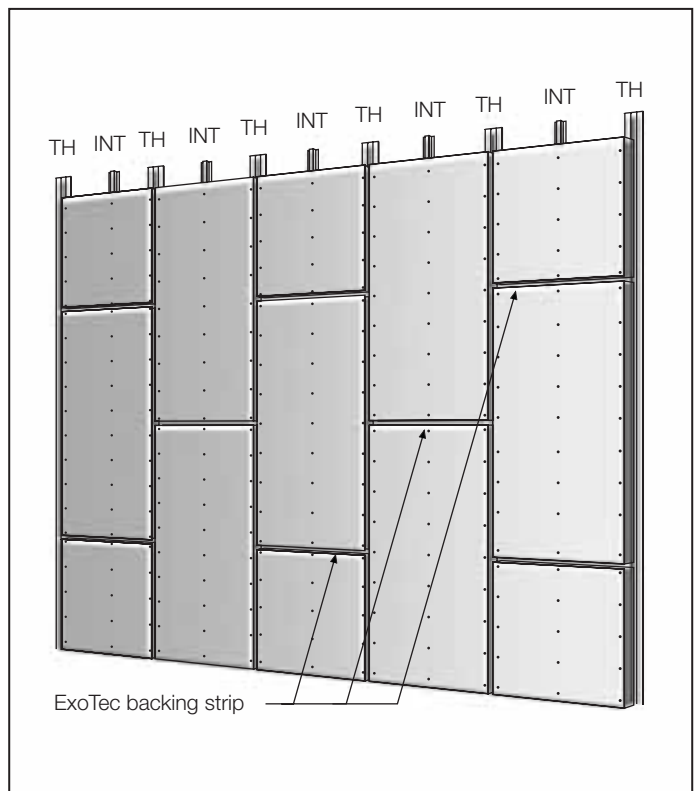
VERTICAL LAYOUT BRICK GRID PATTERN
